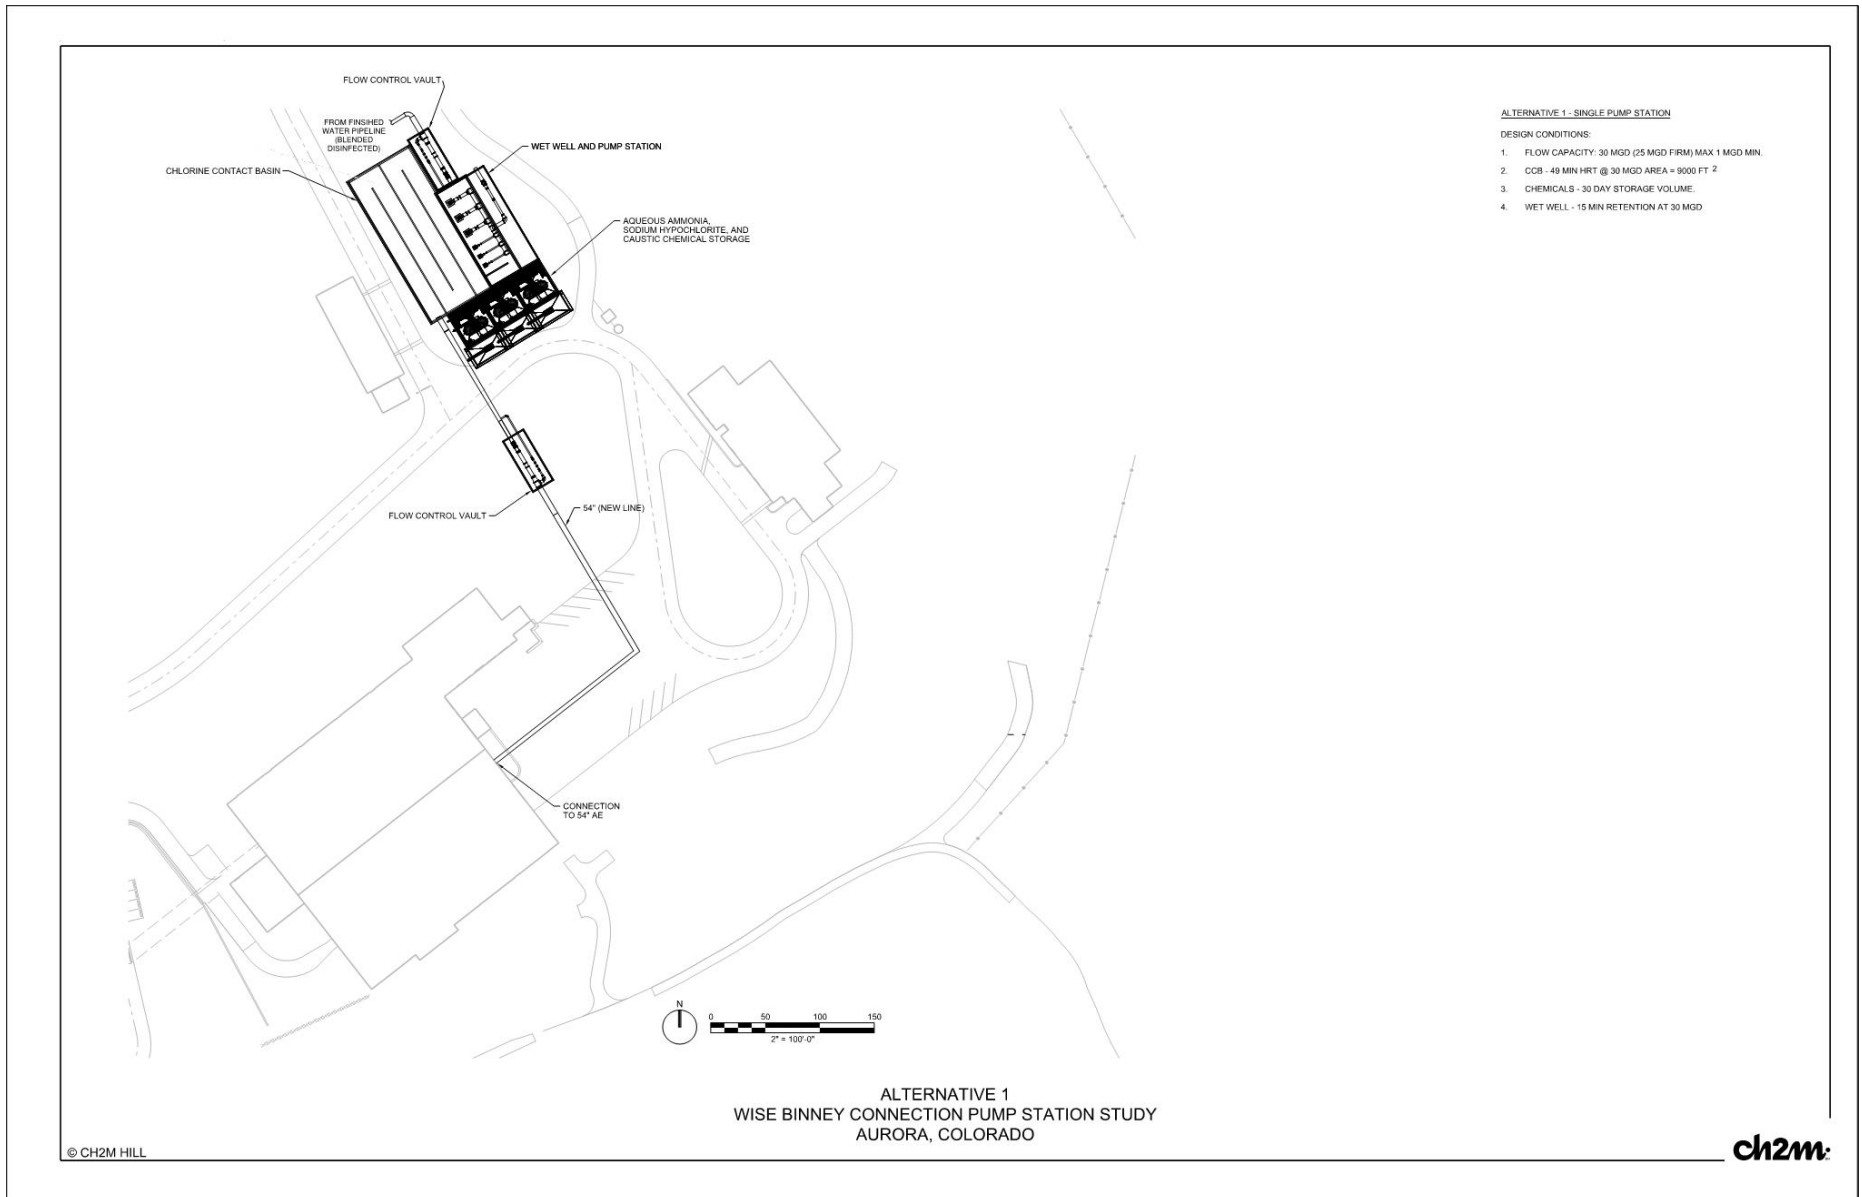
Alternative 1 - Single Pump Station Layout
